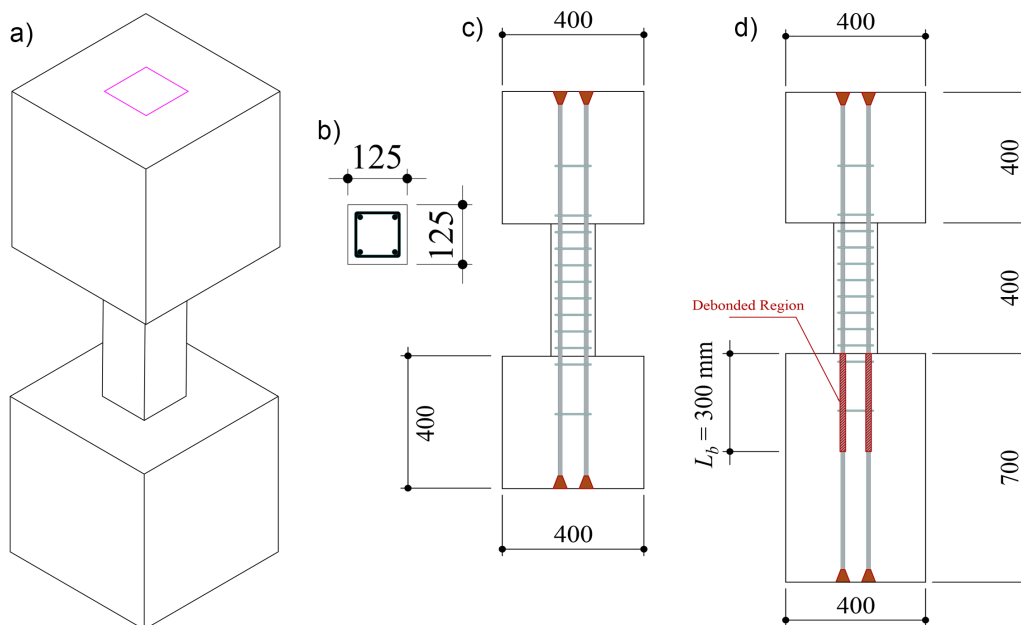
Short Boundary Elements (SBEs) (a) isometric 3-dimensional elevation view (b) cross-section with reinforcement detailing (c) typical unit with reinforcing material used over the entire length (d) Fe-SMAs debonded from concrete over specified height (not to scale) (dimensions in mm)
